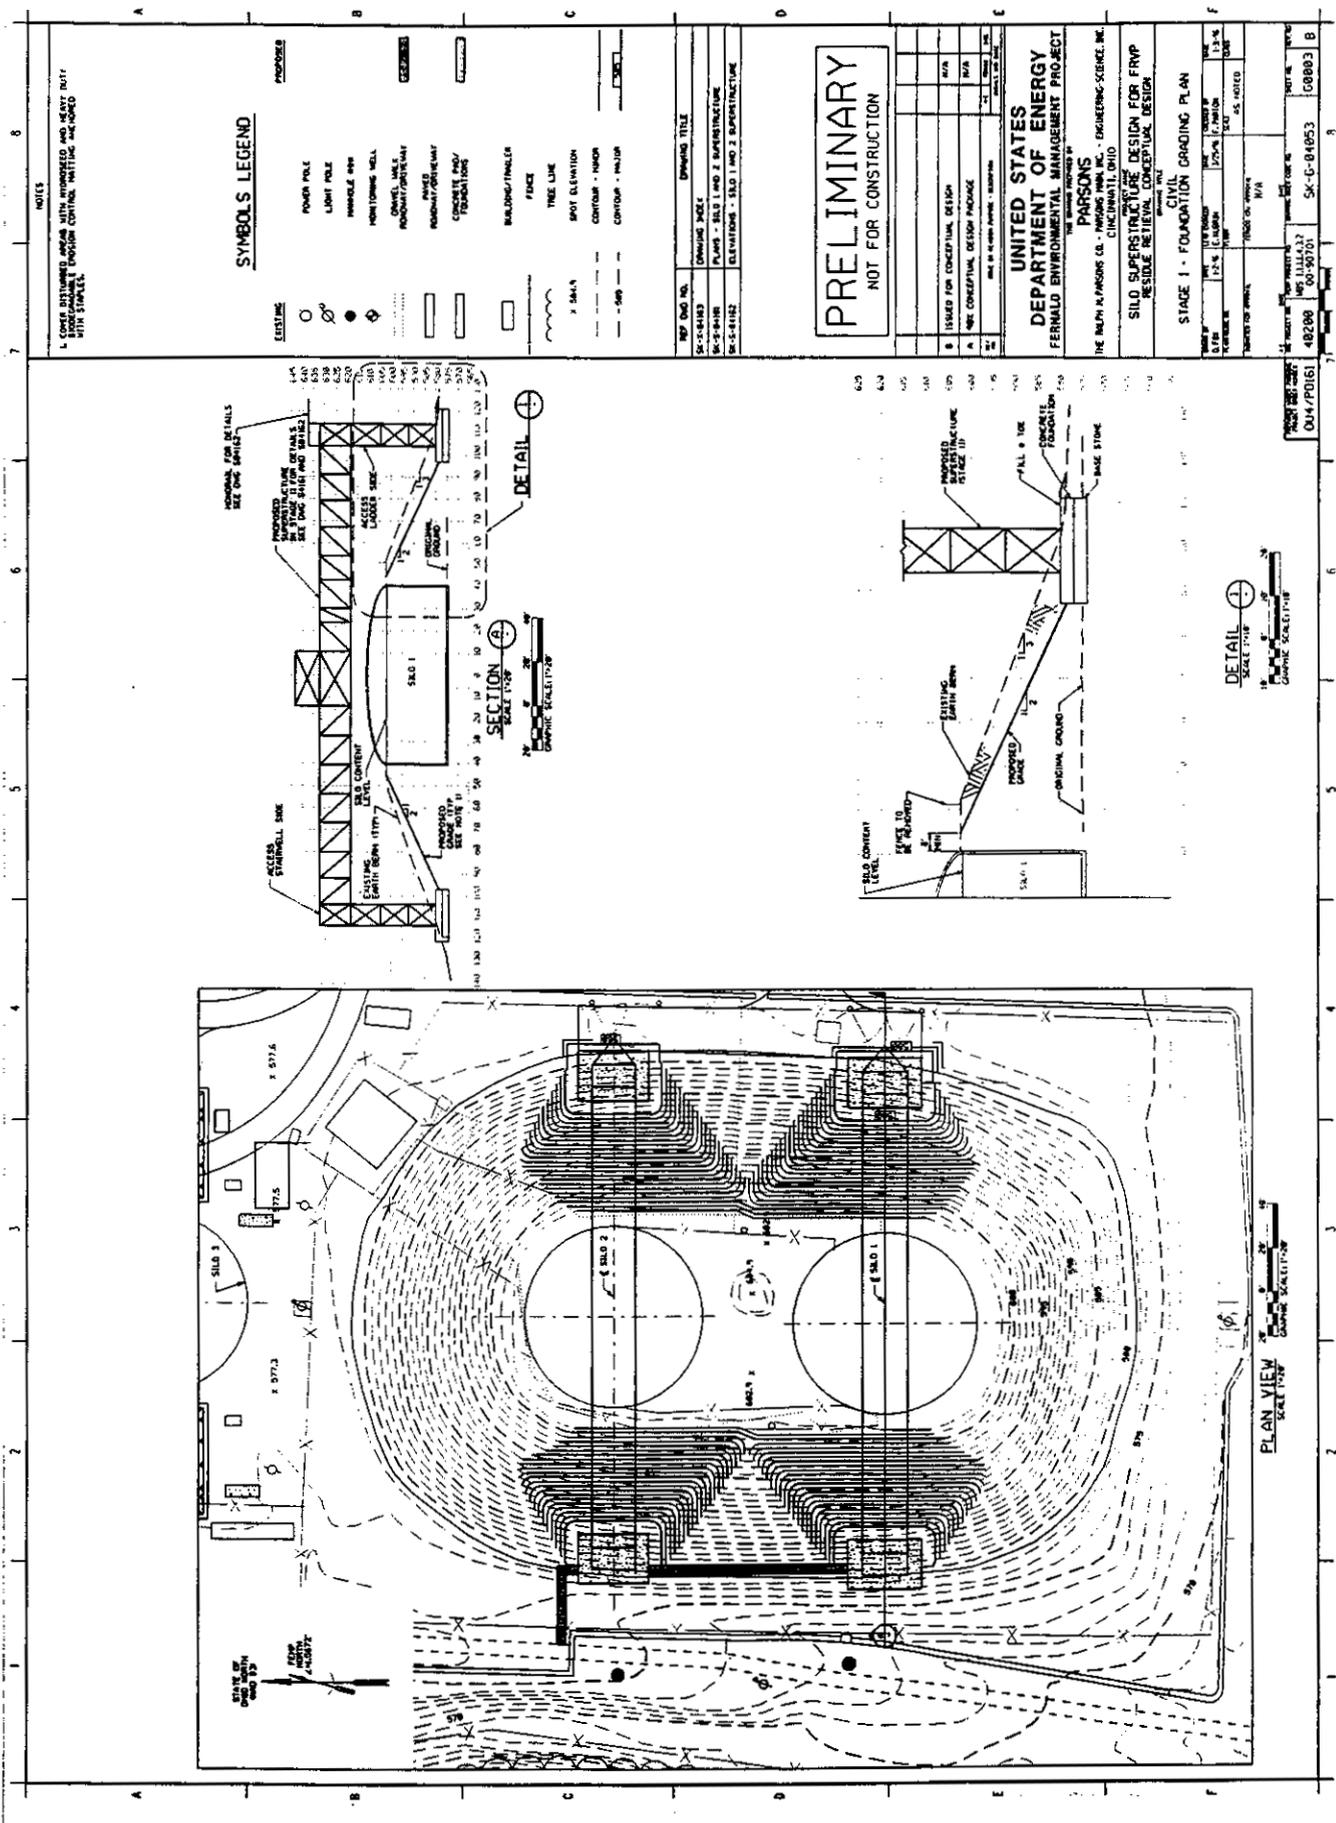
schematically shows plan and elevation views of the proposed superstructures at Silos 1 and 2. Reinforced concrete mat foundations (32 feet by 22 feet) are proposed for superstructure foundations at the four locations shown in Figure 4-1. The design of each foundation is a flat mat with four pedestals which support the columns of the superstructure. A 3-foot shear key below the concrete mat has also been included in the design. The base of the concrete mat is planned at elevation 576.5 feet mean sea level. Below the base of the concrete mat a granular base of compacted gravel will extend to natural soils. Based on design calculations by PARSONS' Structural Engineering Group, the maximum downward vertical design load for each foundation due to superstructure loads is 541 kips, and the maximum horizontal load is 337 kips ("kick-out" loads).
